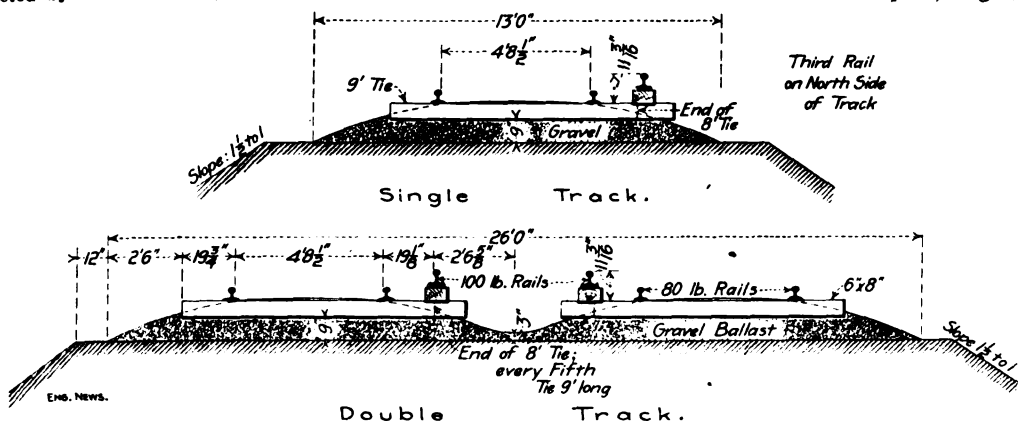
CROSS-SECTIONS OF ROADBED AND TRACK OF THIRD-RAIL ELECTRIC RAILWAY.
